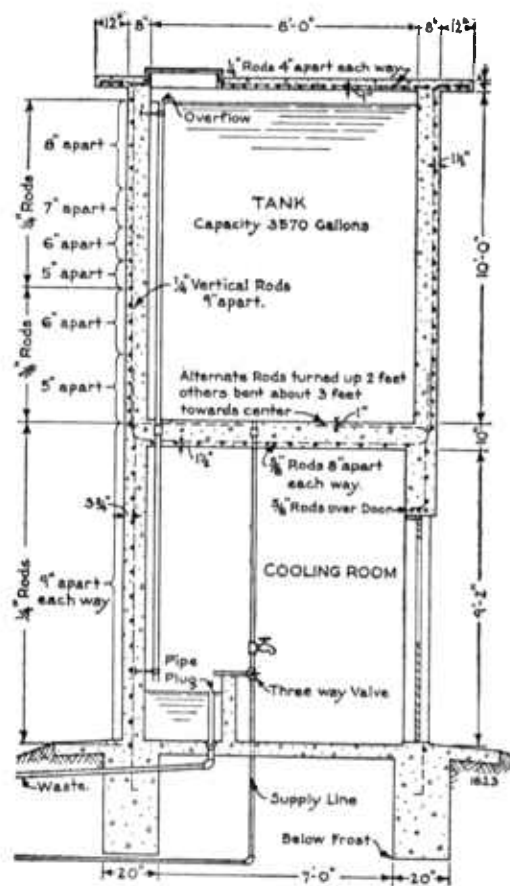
Working drawing for a combined cooling room and round reinforced concrete tank. Suggested mixtures for concrete: Tank walls and tank bottom 1: 2: 3 (1 volume cement, 2 volumes sand, 3 volumes stone, none larger than $\frac{3}{4}$ inch); cooling room walls 1: 2: 4; foundation 1: 2 $\frac{1}{2}$: 5
